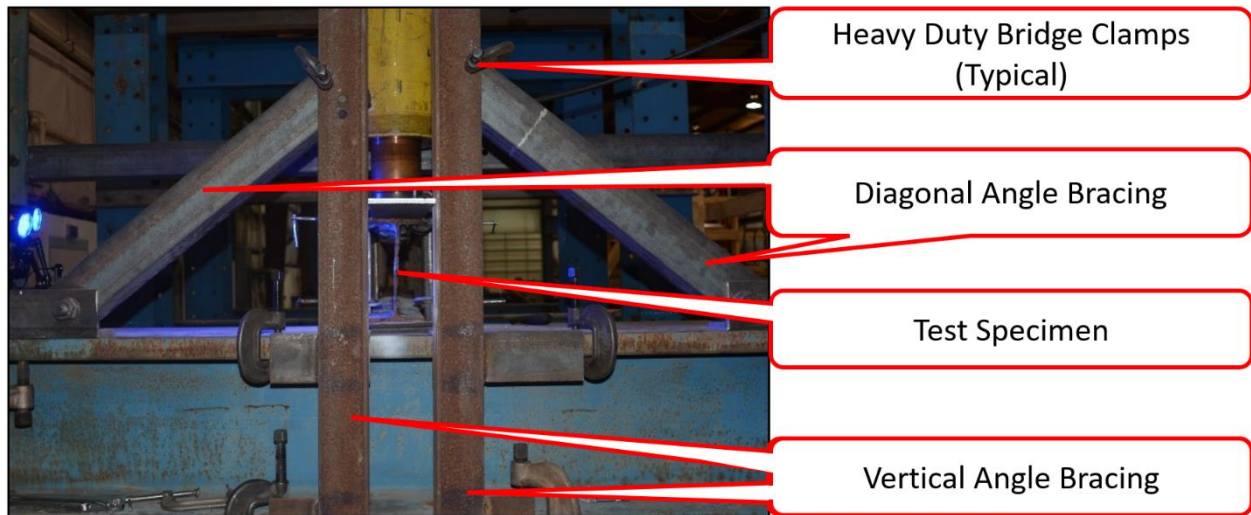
Elevation View of Full-Scale Beam Testing Configuration
